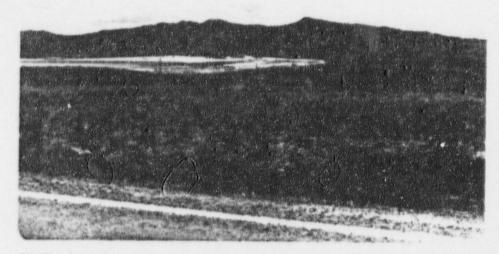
OVERVIEW OF MAIN EMBANKMENT FROM NORTH END LOOKING SOUTH.
